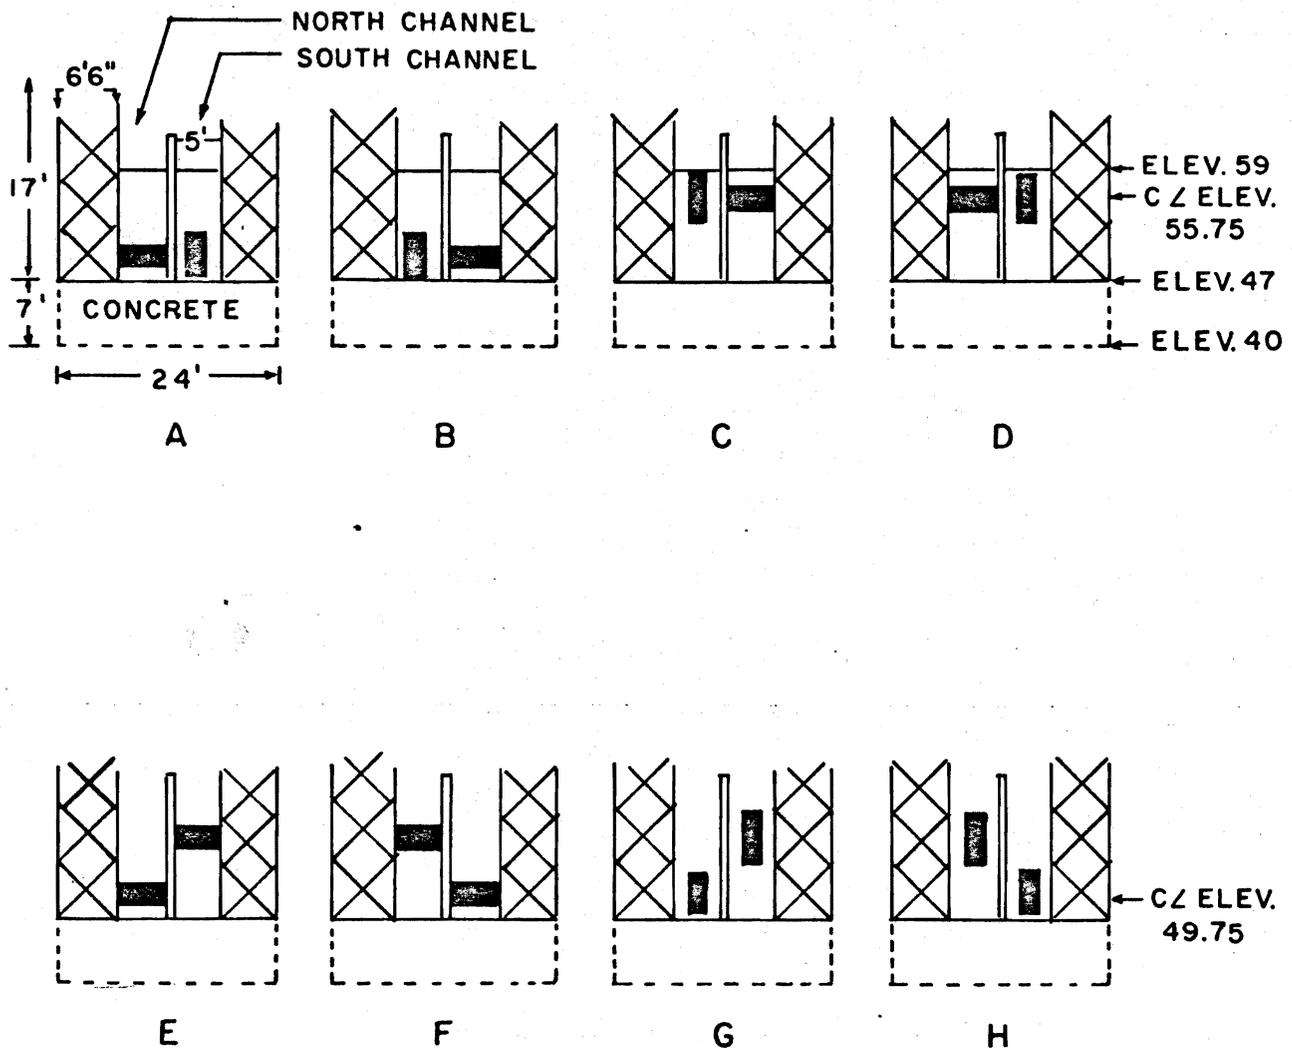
Sectional views showing eight test conditions used in orifice study.
